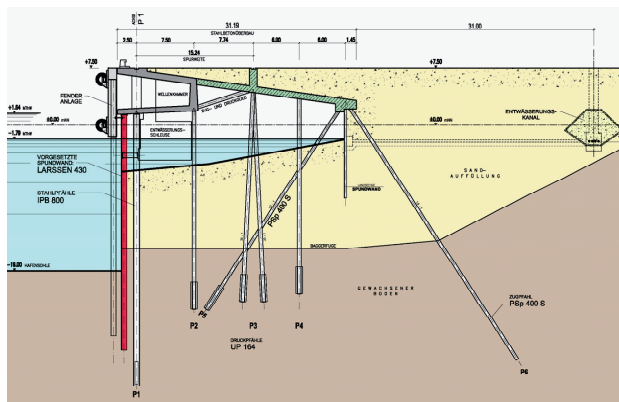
Cross-section of quay wall Bremerhaven 2006 [Vollstedt 2008]
